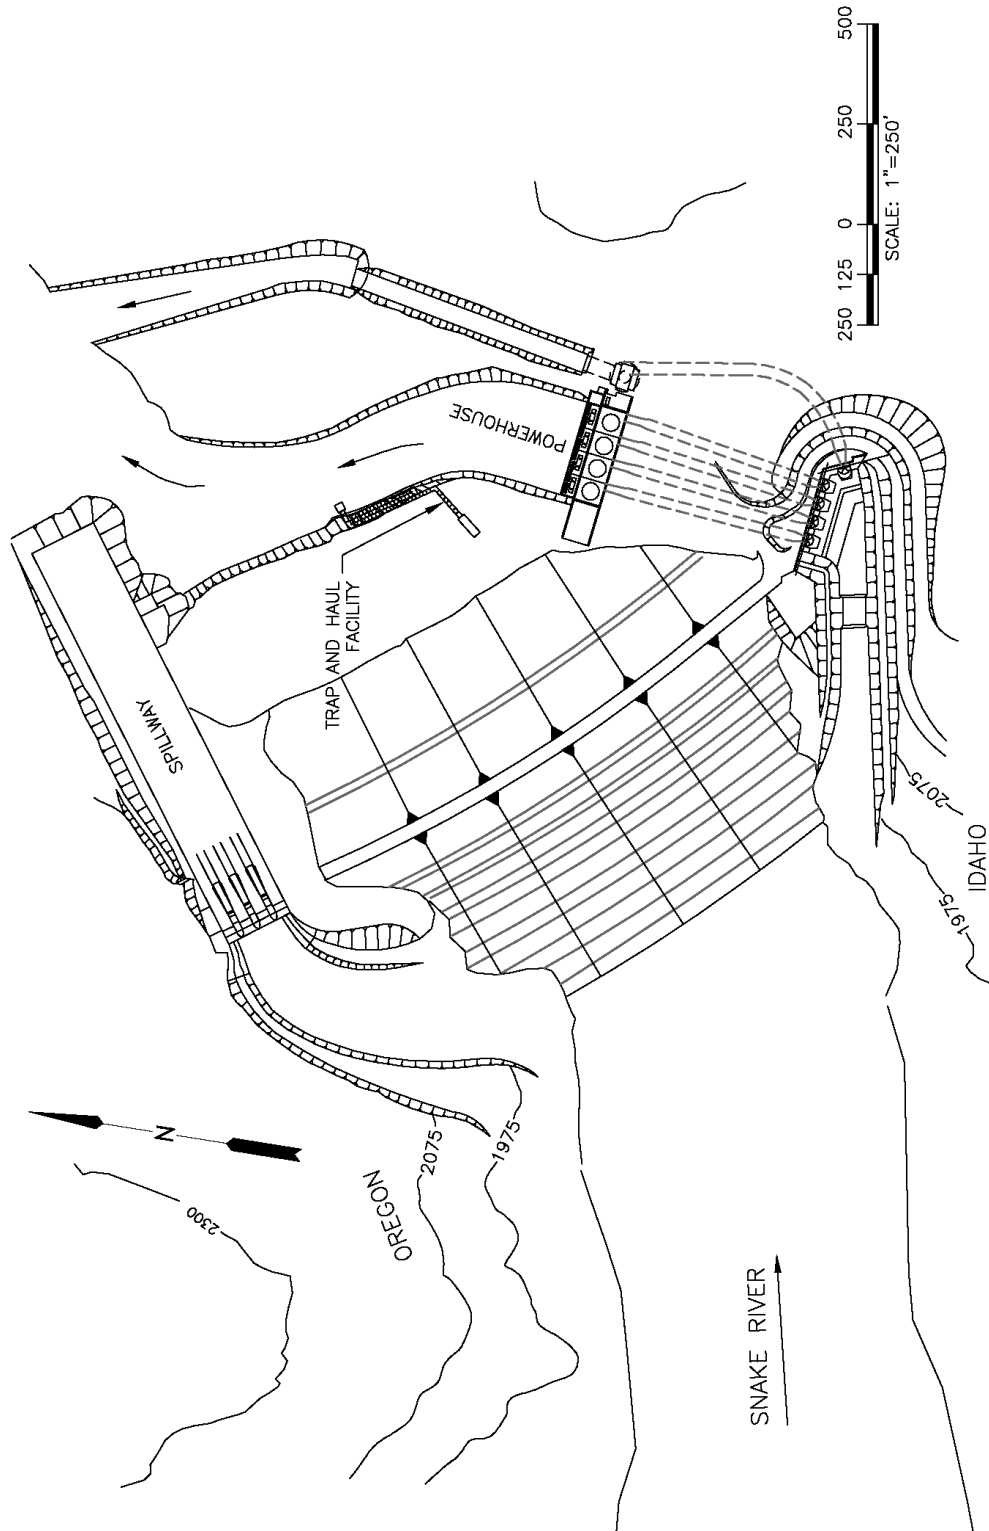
Proposed location of trap-and-haul facility at Brownlee Dam.
